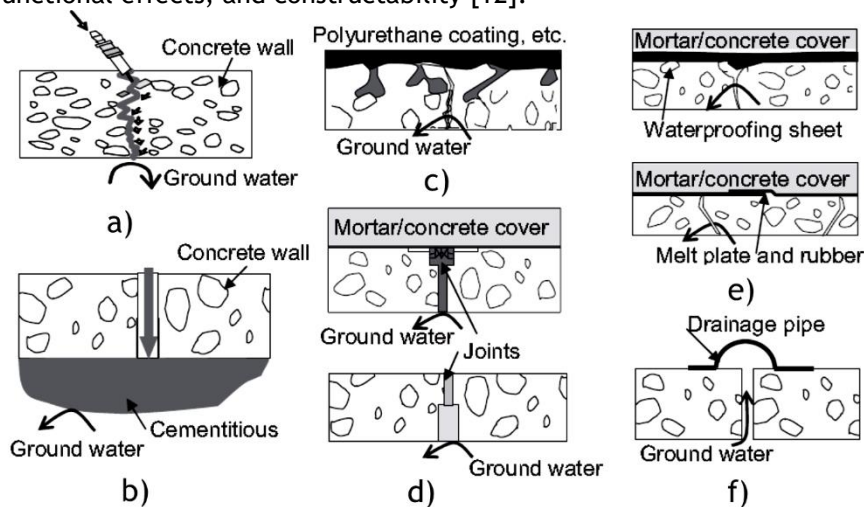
Tunnel waterproofing approaches; a) crack seals, b) ground grouting, c) surface coatings, d) joints seals, e) membrane sand f) rerouting [12].
